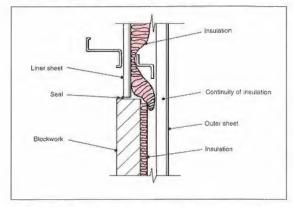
Detail B: The liner is able to run down in front of the outer face of the cavity wall.
